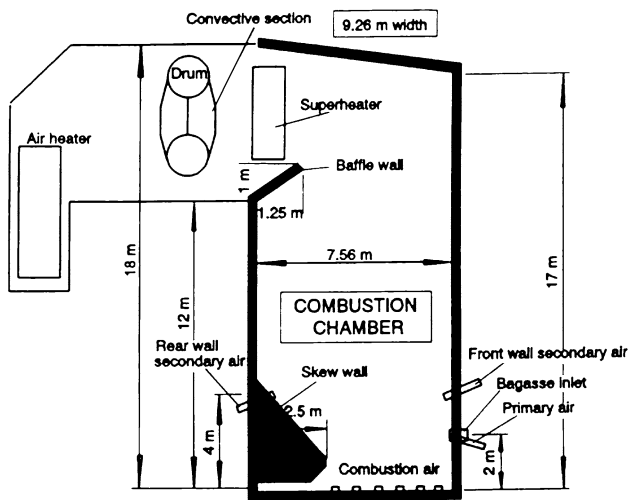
Section through a Queensland boiler firing 60 tph of bagasse and generating 150 tph of steam at 1.75 MPa and 280°C [16]
